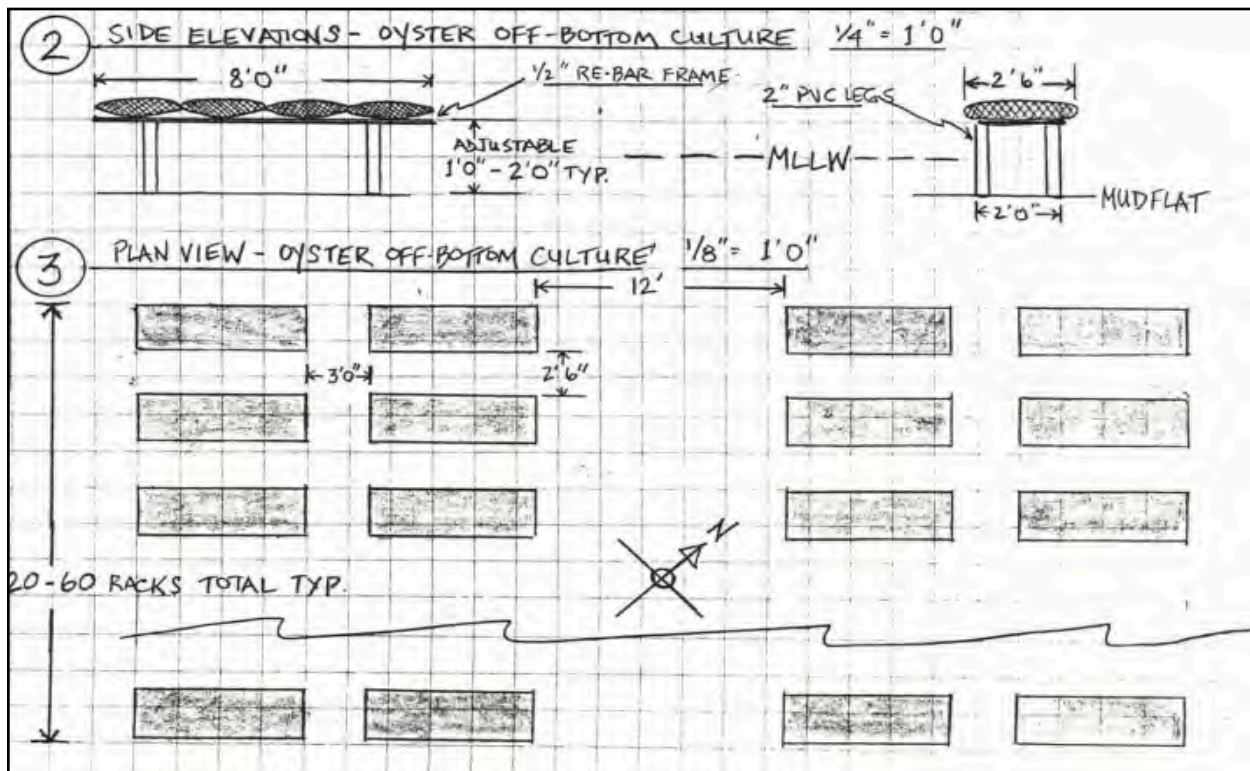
Sketch drawing of plan and layout for “rack on pipe” culture system
